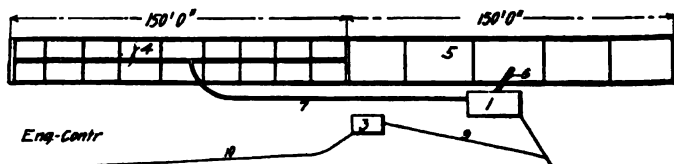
(1) Centrifugal Pump; (2) Boiler; (3) Piston Pump; (4) Pipe in Trench; (5) Trench Being Excavated; (6) Suction Pipe; (7) Discharge Pipe; (8) and (9) Steam Pipes; (10) Pipe to Water Supply.
